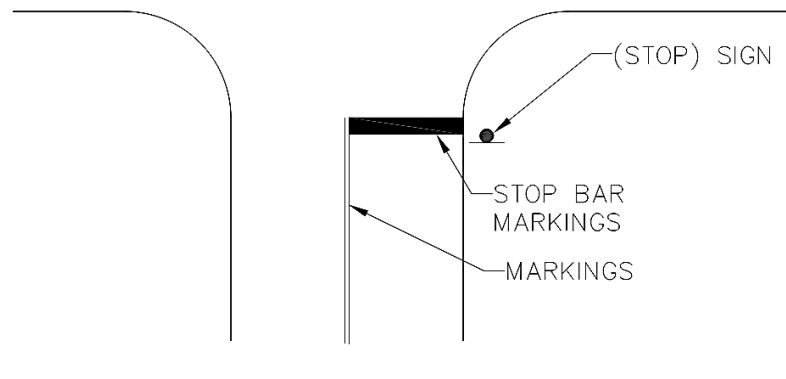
Drive Approach: Single Lane Egress/Ingress
